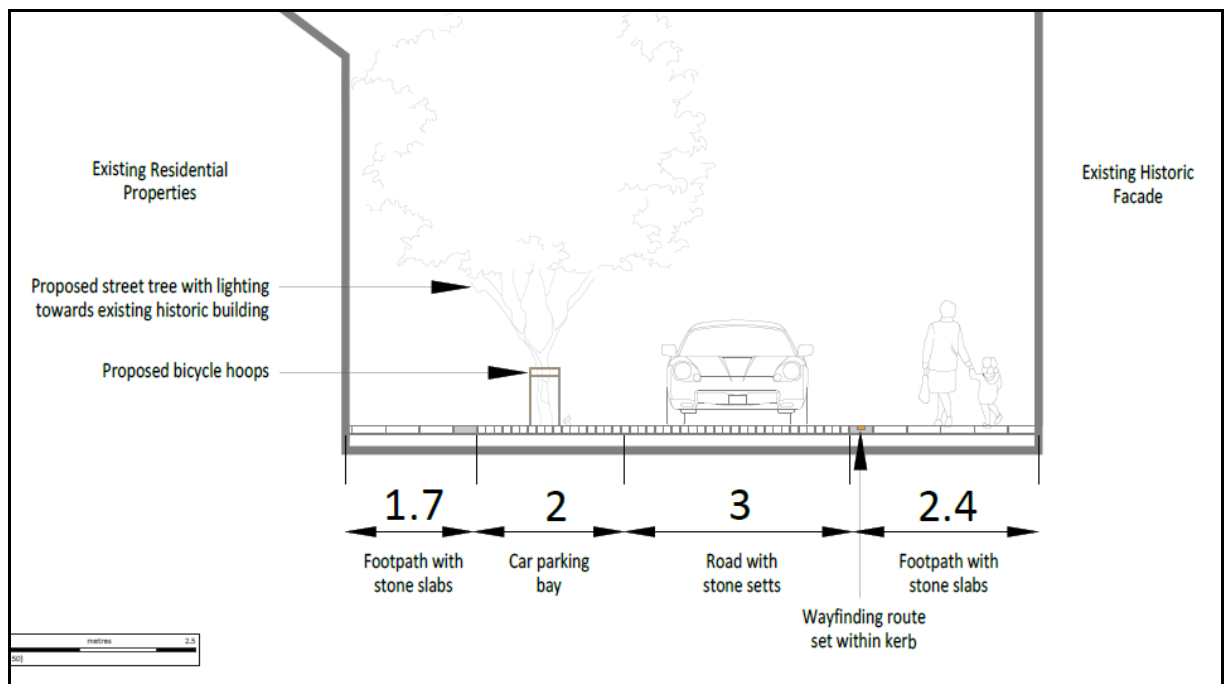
Narrow Parking Bay Width (Section U-U Fair Street)
